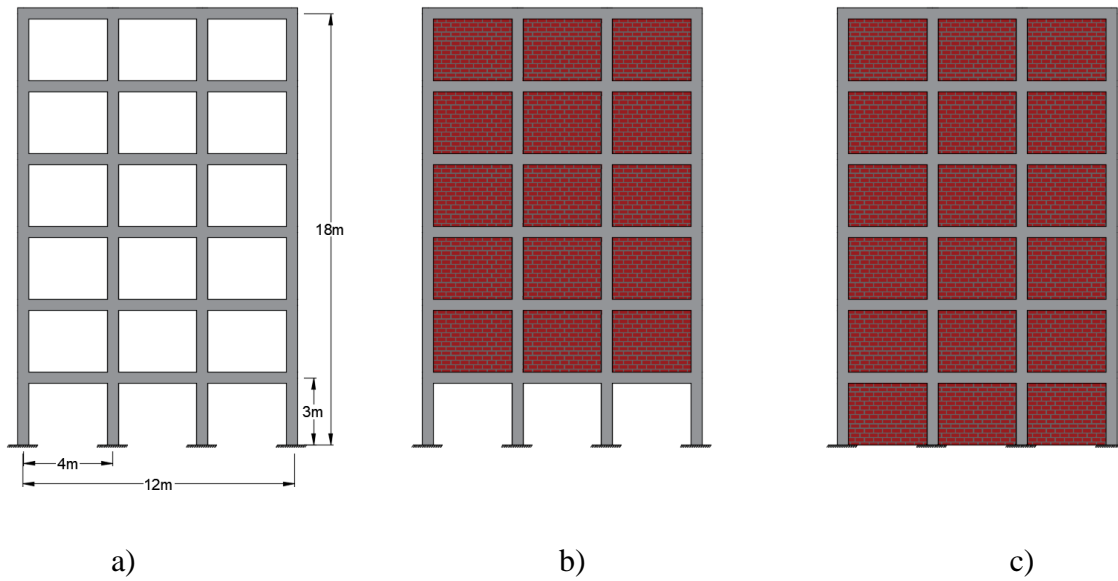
Elevation of three bay-six storey (3B6S), a) bare frame/with deficiencies b) infilled frame without ground infills (stone-concrete/concrete masonry) c) infilled frame (stone-concrete/concrete masonry)
